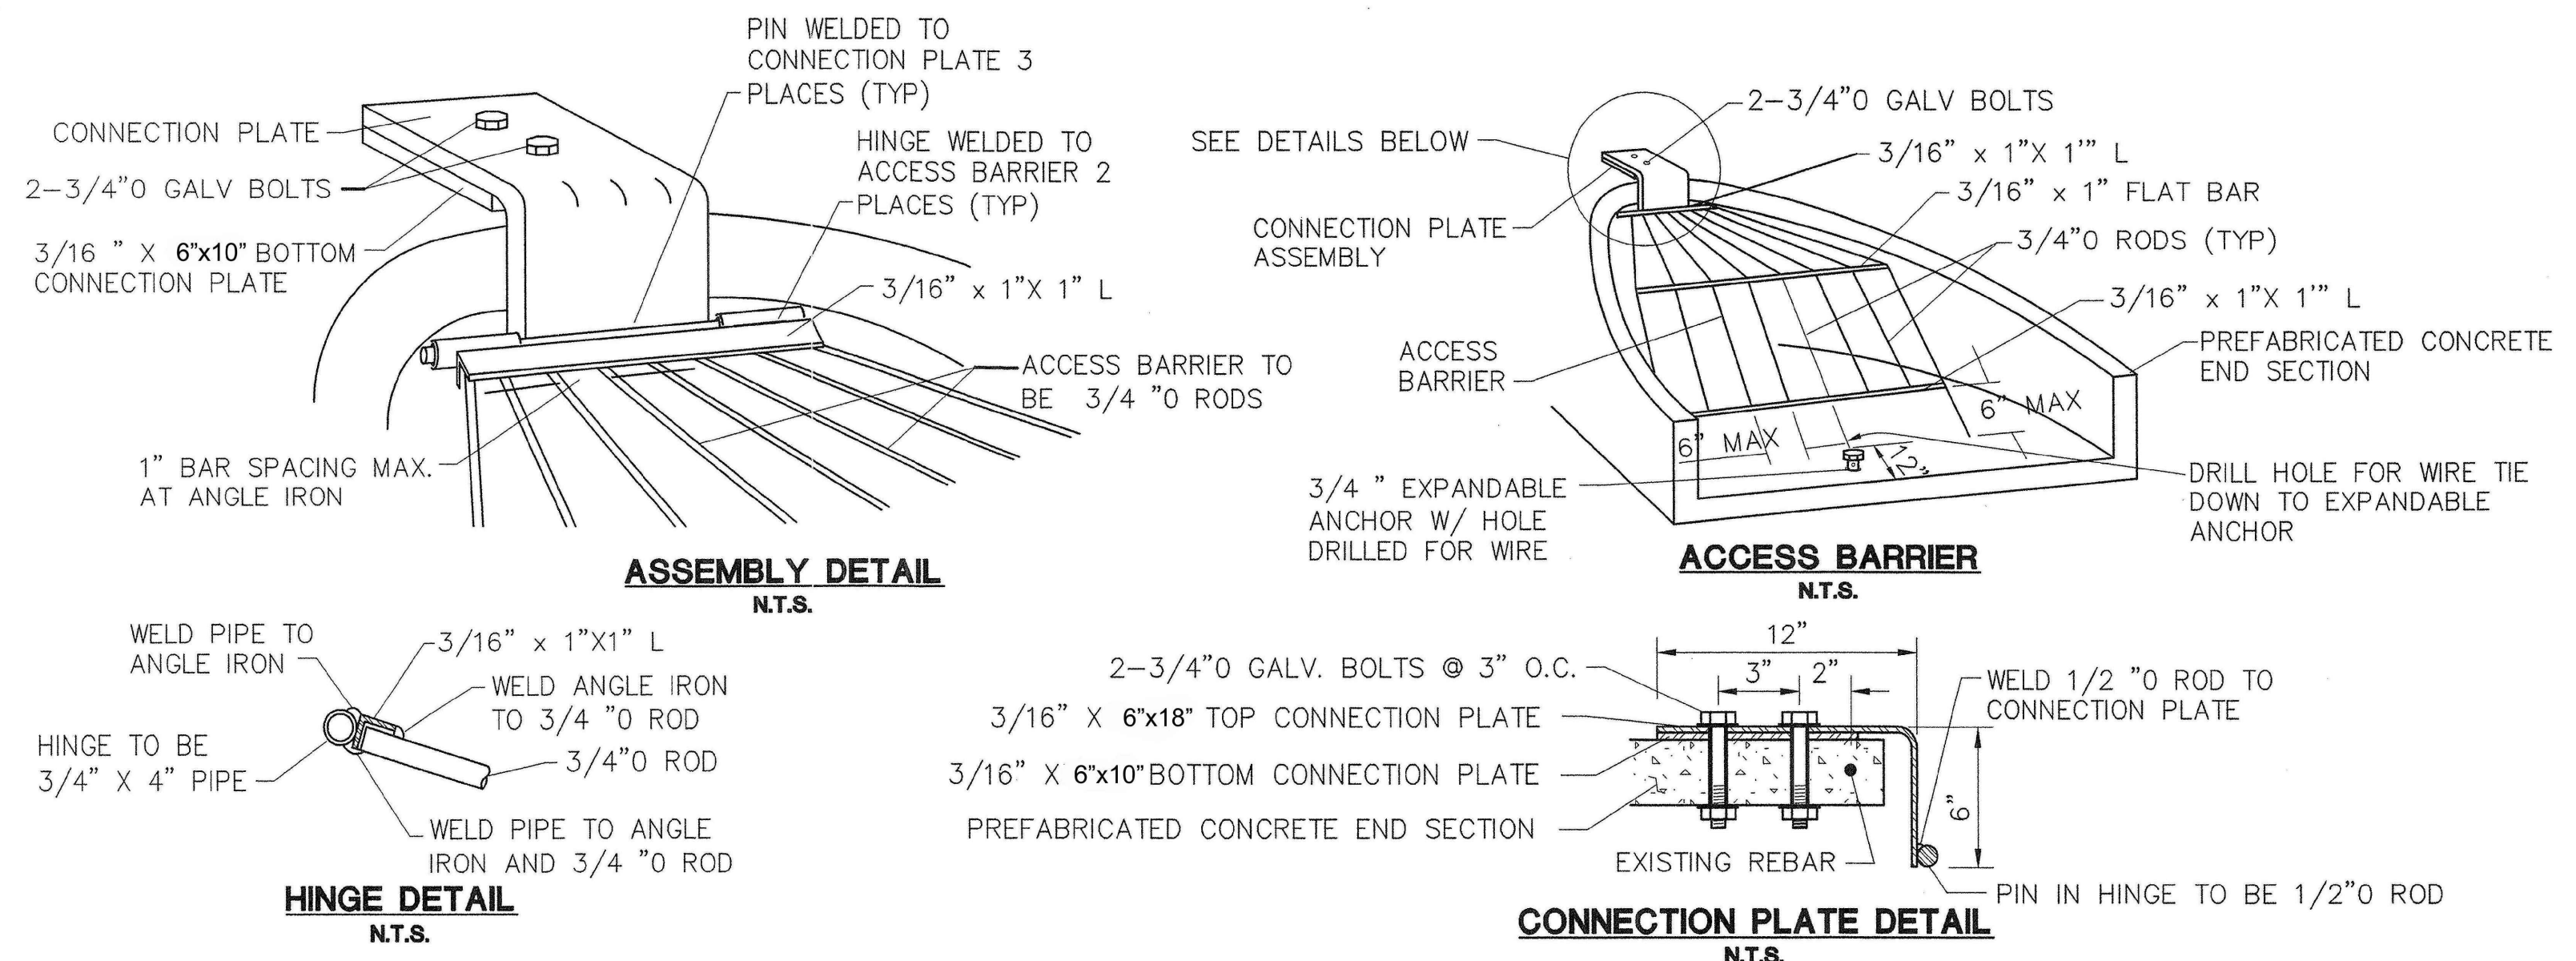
MARICOPA ASSOCIATION OF GOVERNMENTS STANDARD DETAIL ENGLISH END SECTION-REINFORCED CONCRETE PIPE REVISED 01-01-1998 DETAIL NO. 545
